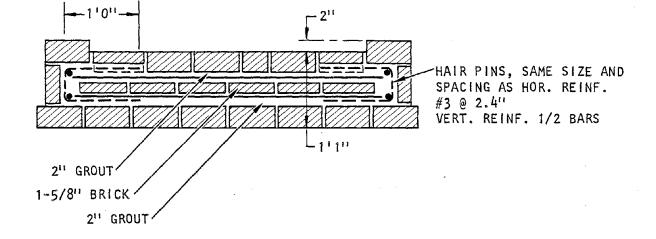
PIER SECTION SHOWING TYPICAL DETAIL AT JAMBS FOR 13" BRICK WALLS
